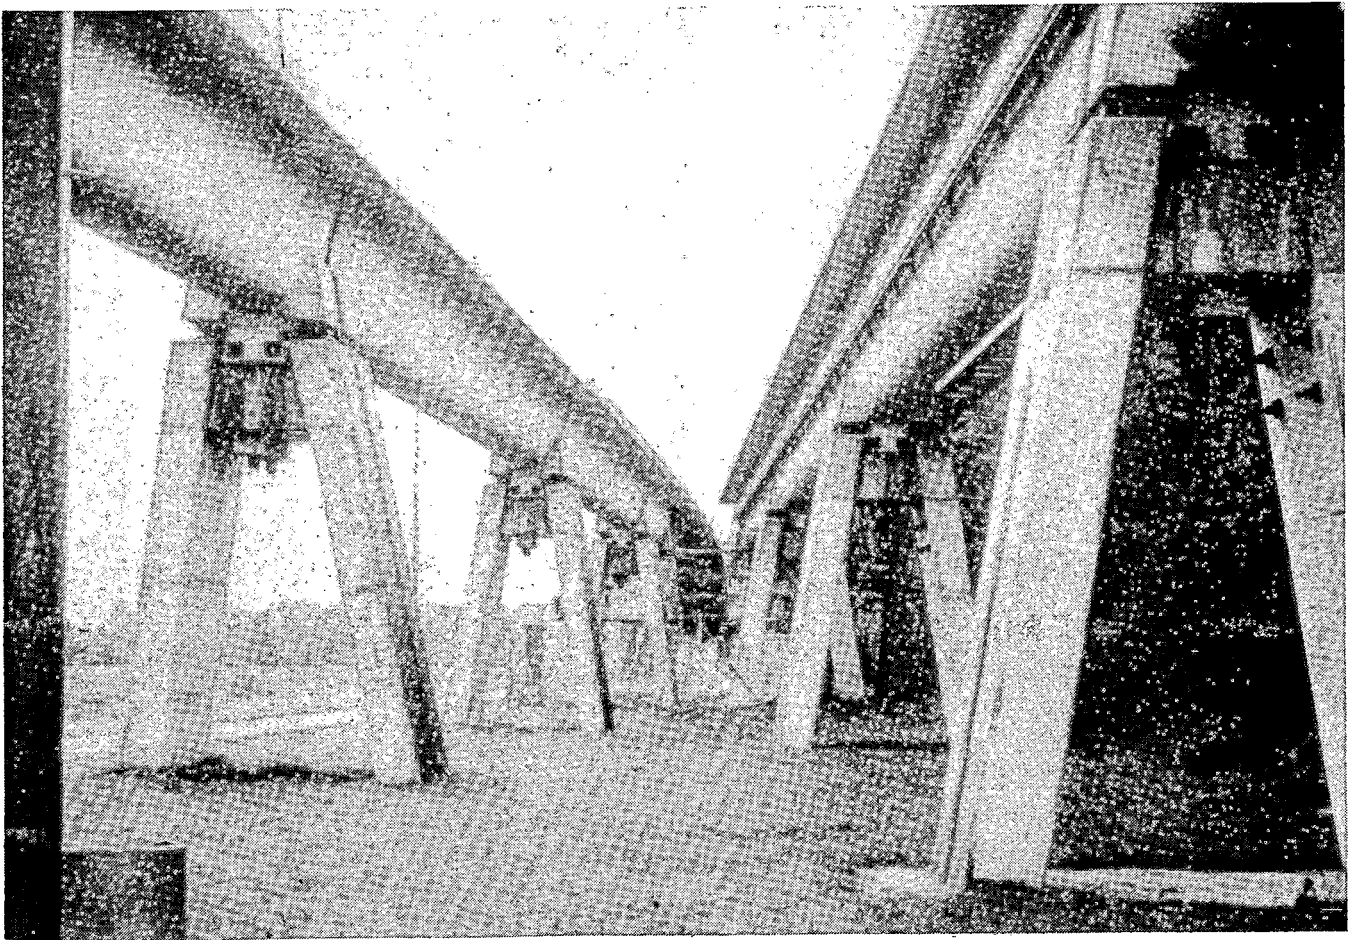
Photograph of Switch at Emsland Test Track, Germany
